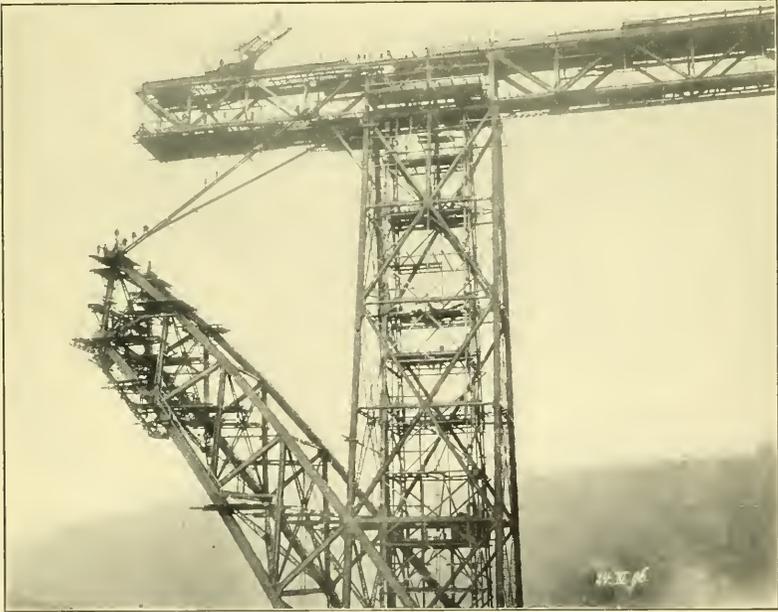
ERECTION OF THE MUNGSTEN, OR KAISER WILHELM BRIDGE.
